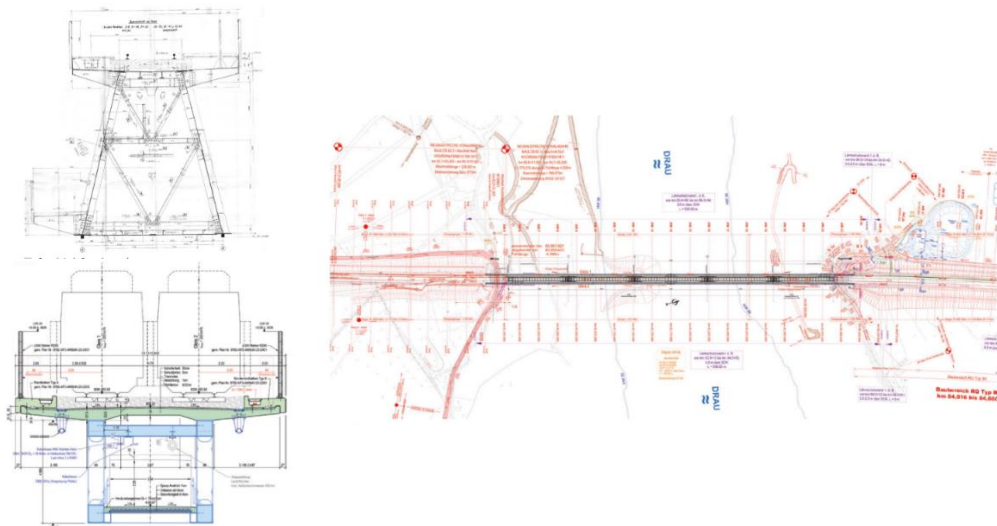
Existing Jauntal Railway Bridge prior to rehabilitation and the new double-track composite steel–concrete bridge solution
